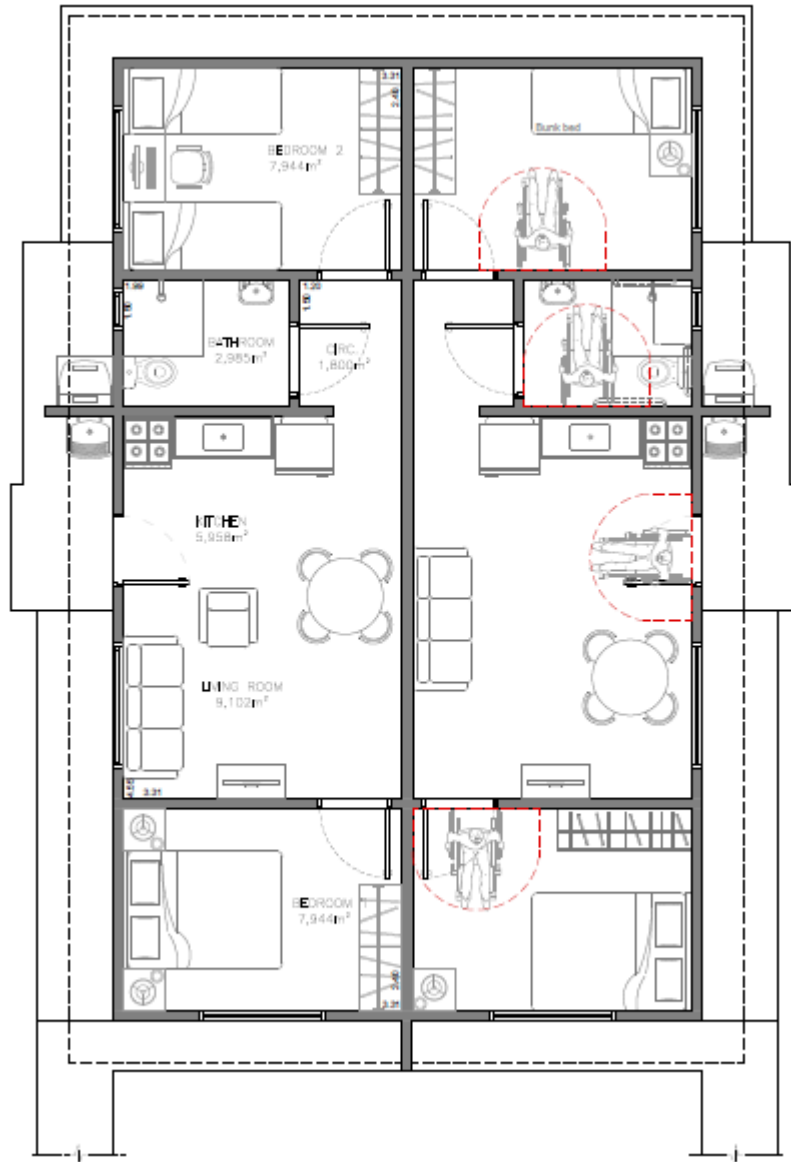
Floor plan of a standard house of Celina Jallad.
